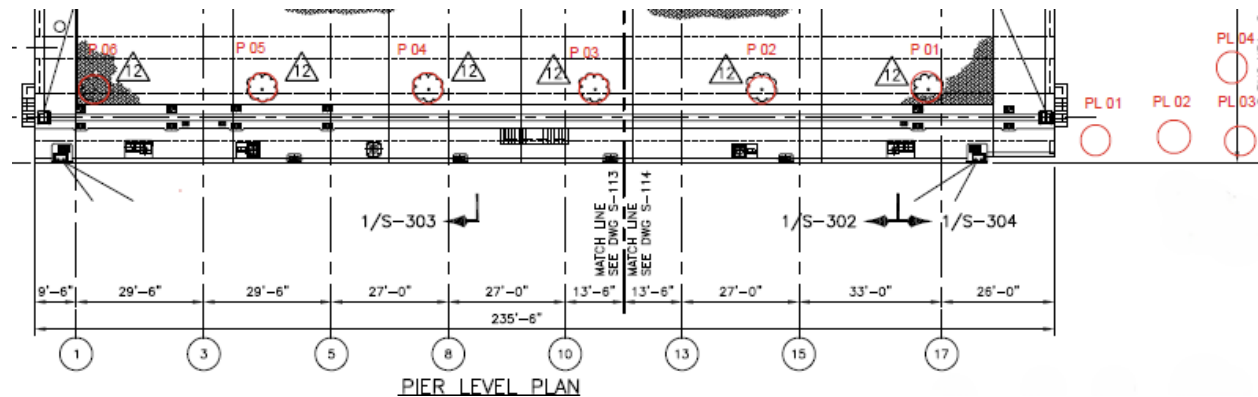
Ports Located on the Pier Deck and the Parking Lot Areas
